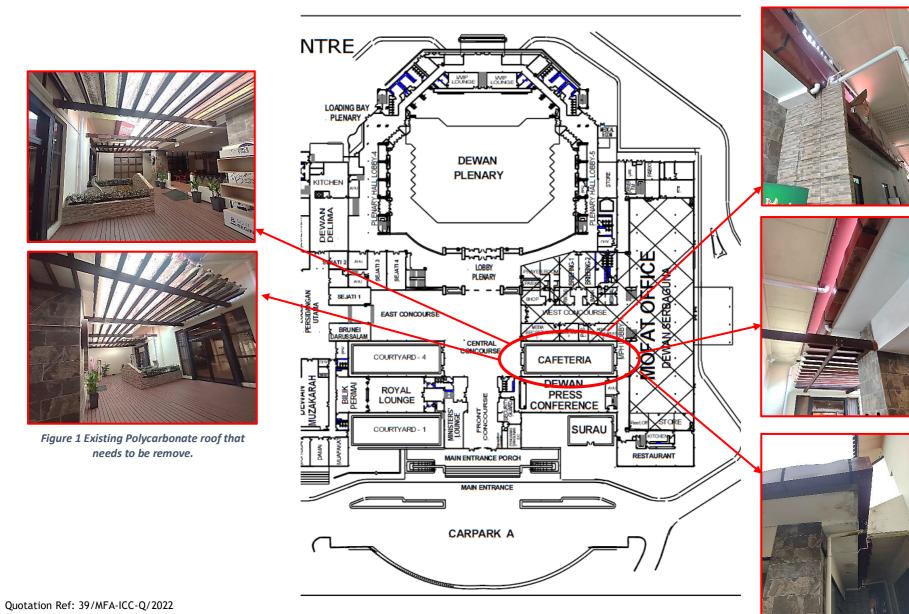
Damaged ICC building's steel gutter & PVC downpipe
